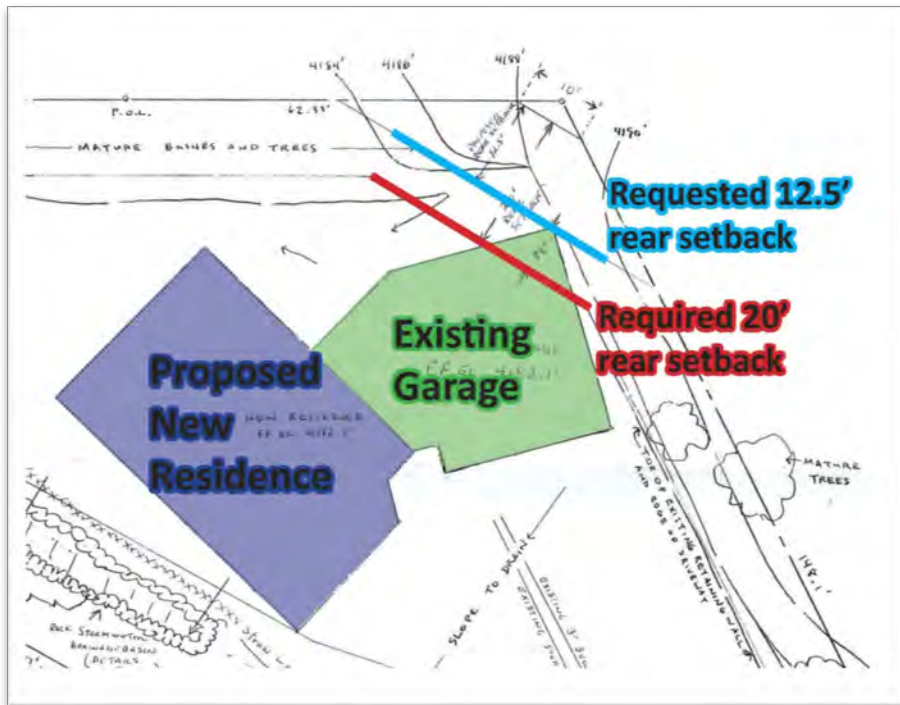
Enlarged site plan showing existing garage, proposed residence, and required and requested setbacks
